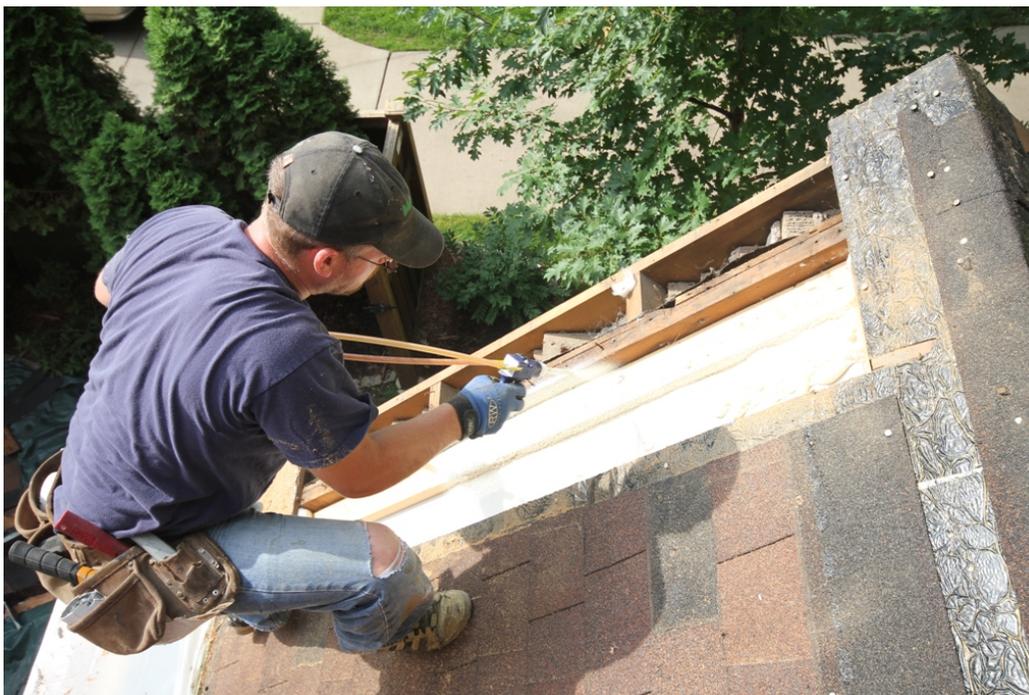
Air sealing the gable wall/roof connection using closed cell spray polyurethane foam
